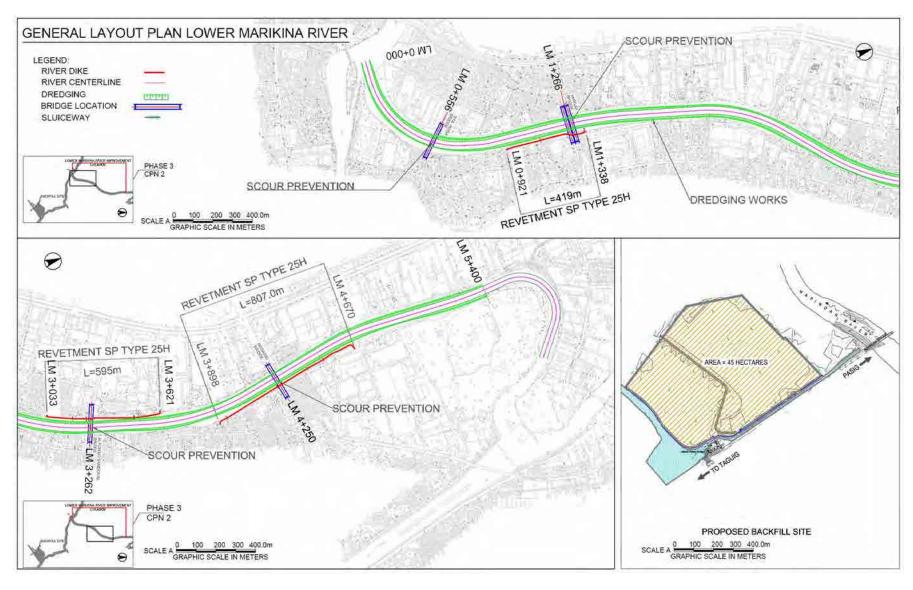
General Layout Plan(Lower Marikina River)
